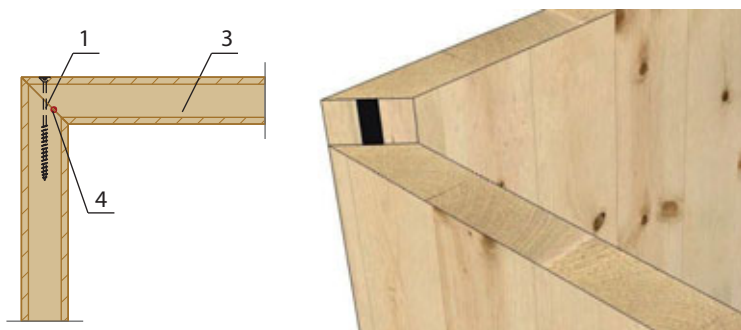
DETAIL OF CORNER JUNCTION 124,84 – JOINT WITH OVERLAP
